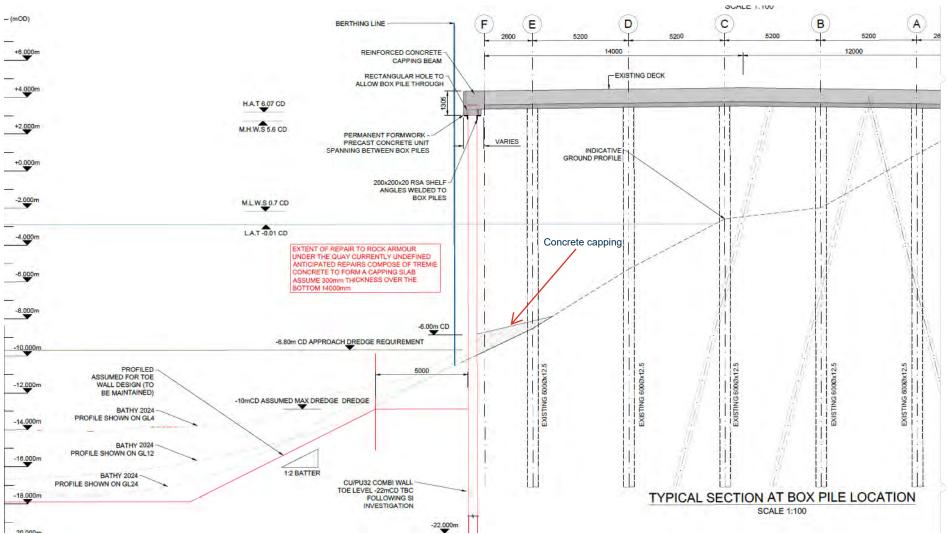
Typical cross section of the improvement works to the PCW (proposed new pile shown in red)
